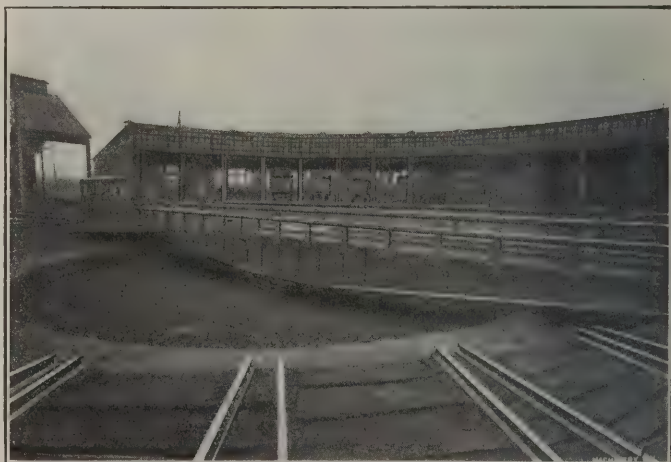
Turntable Driven by 71-2 H.P. Motor.
